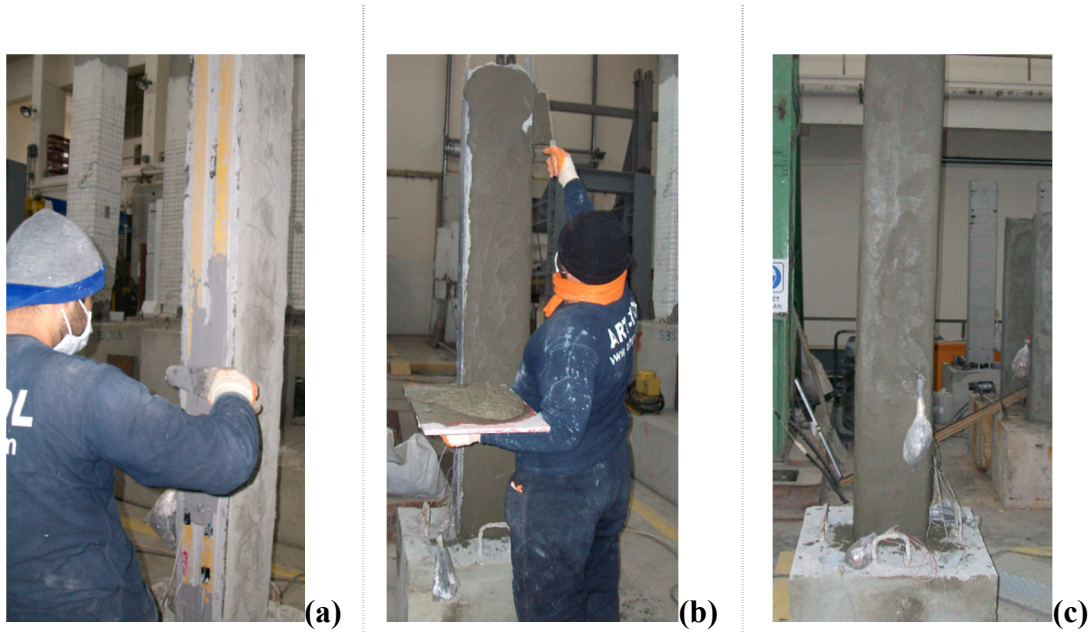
Retfotting columns: (a)Applying epoxy primer on column surfaces. (b)Reprofiling column surface with SRM. (c)Reprofiled column prior to FRP confinement.
